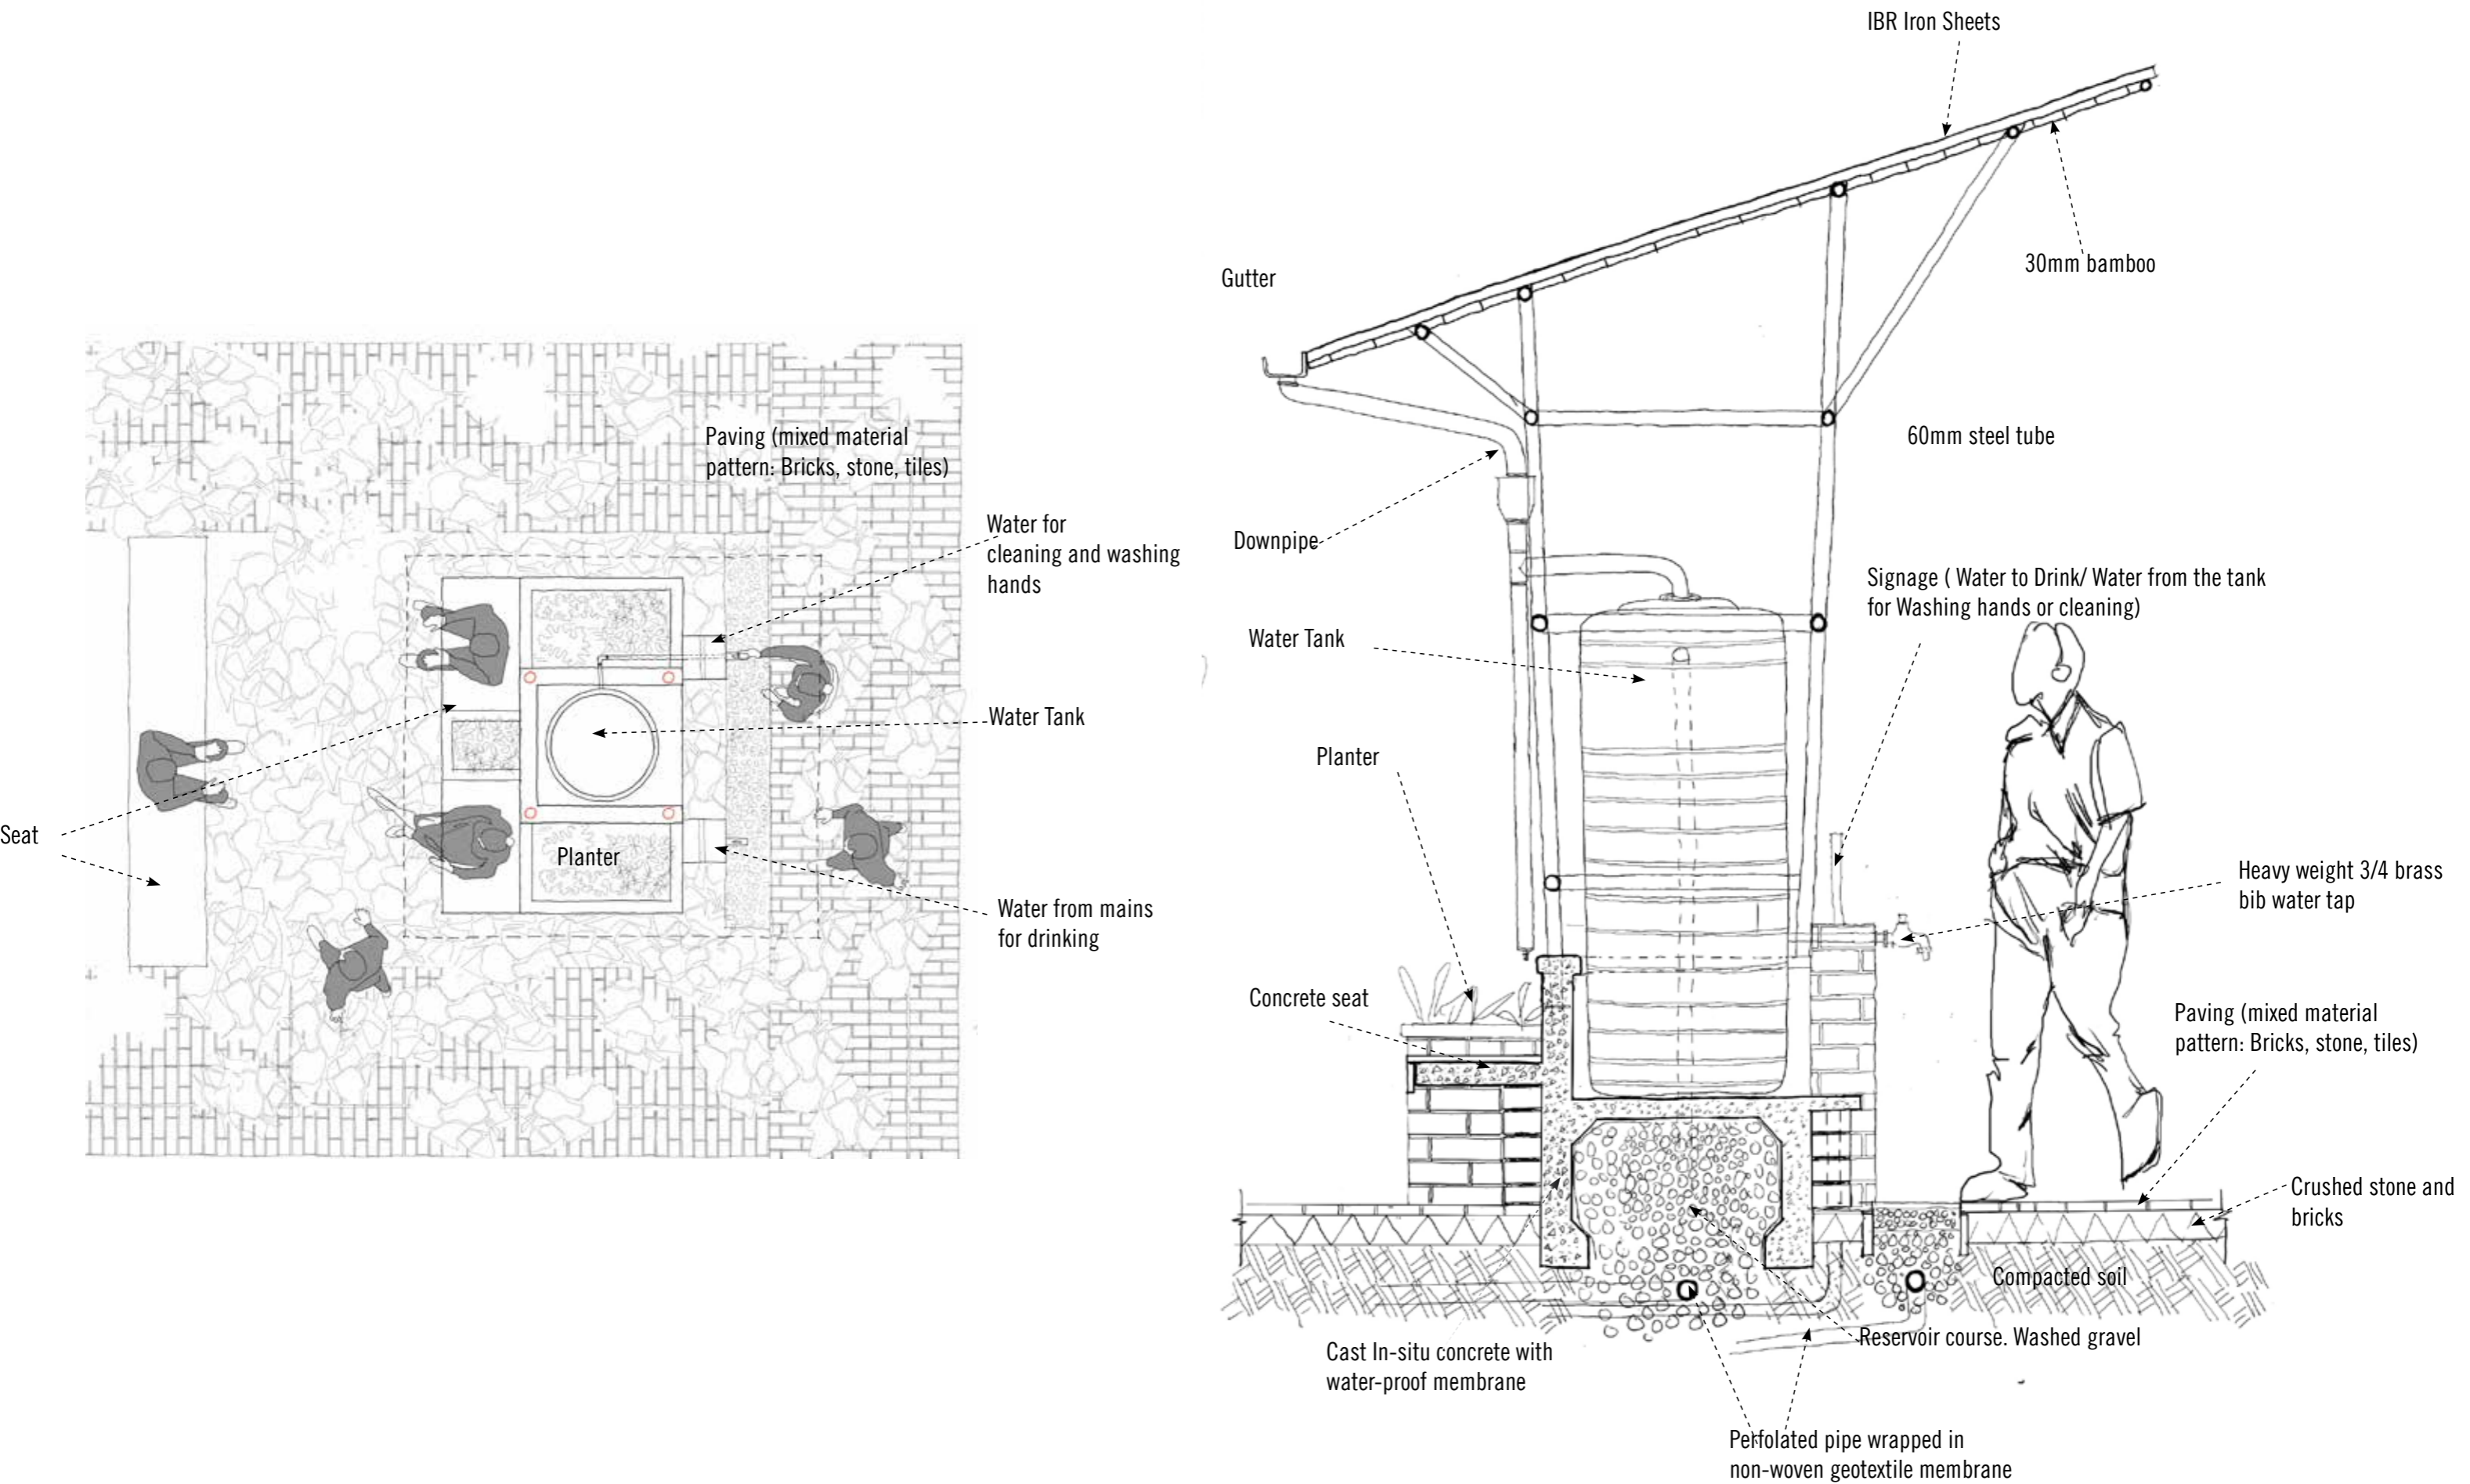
Water Point Floor Plan (Scale: 1:20) & Section (Scale: 1:10).
